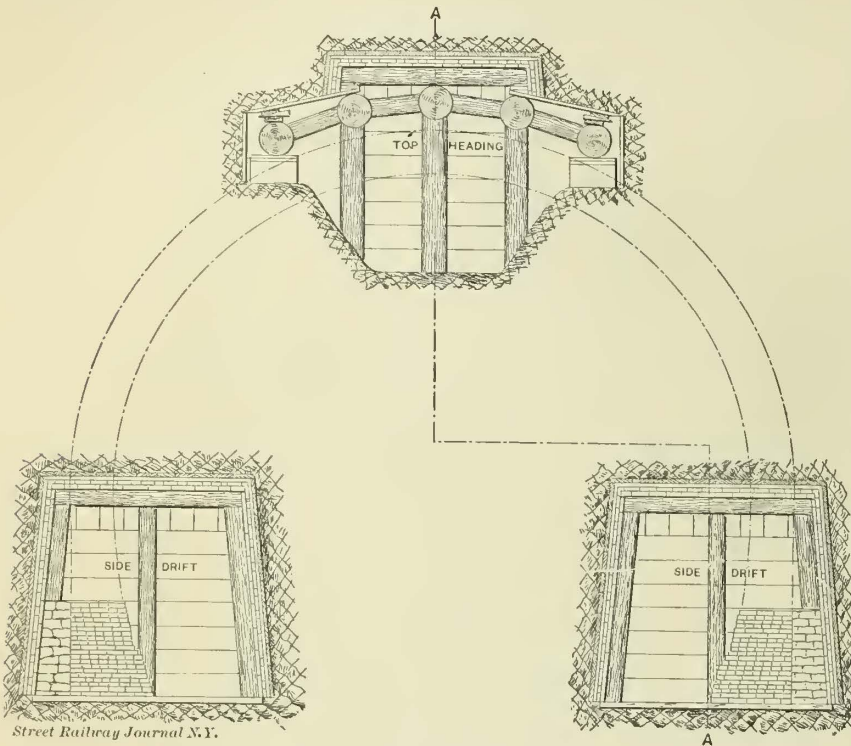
TRANSVERSE SECTION OF TUNNEL DURING CONSTRUCTION—BALTIMORE BELT RAILWAY.
